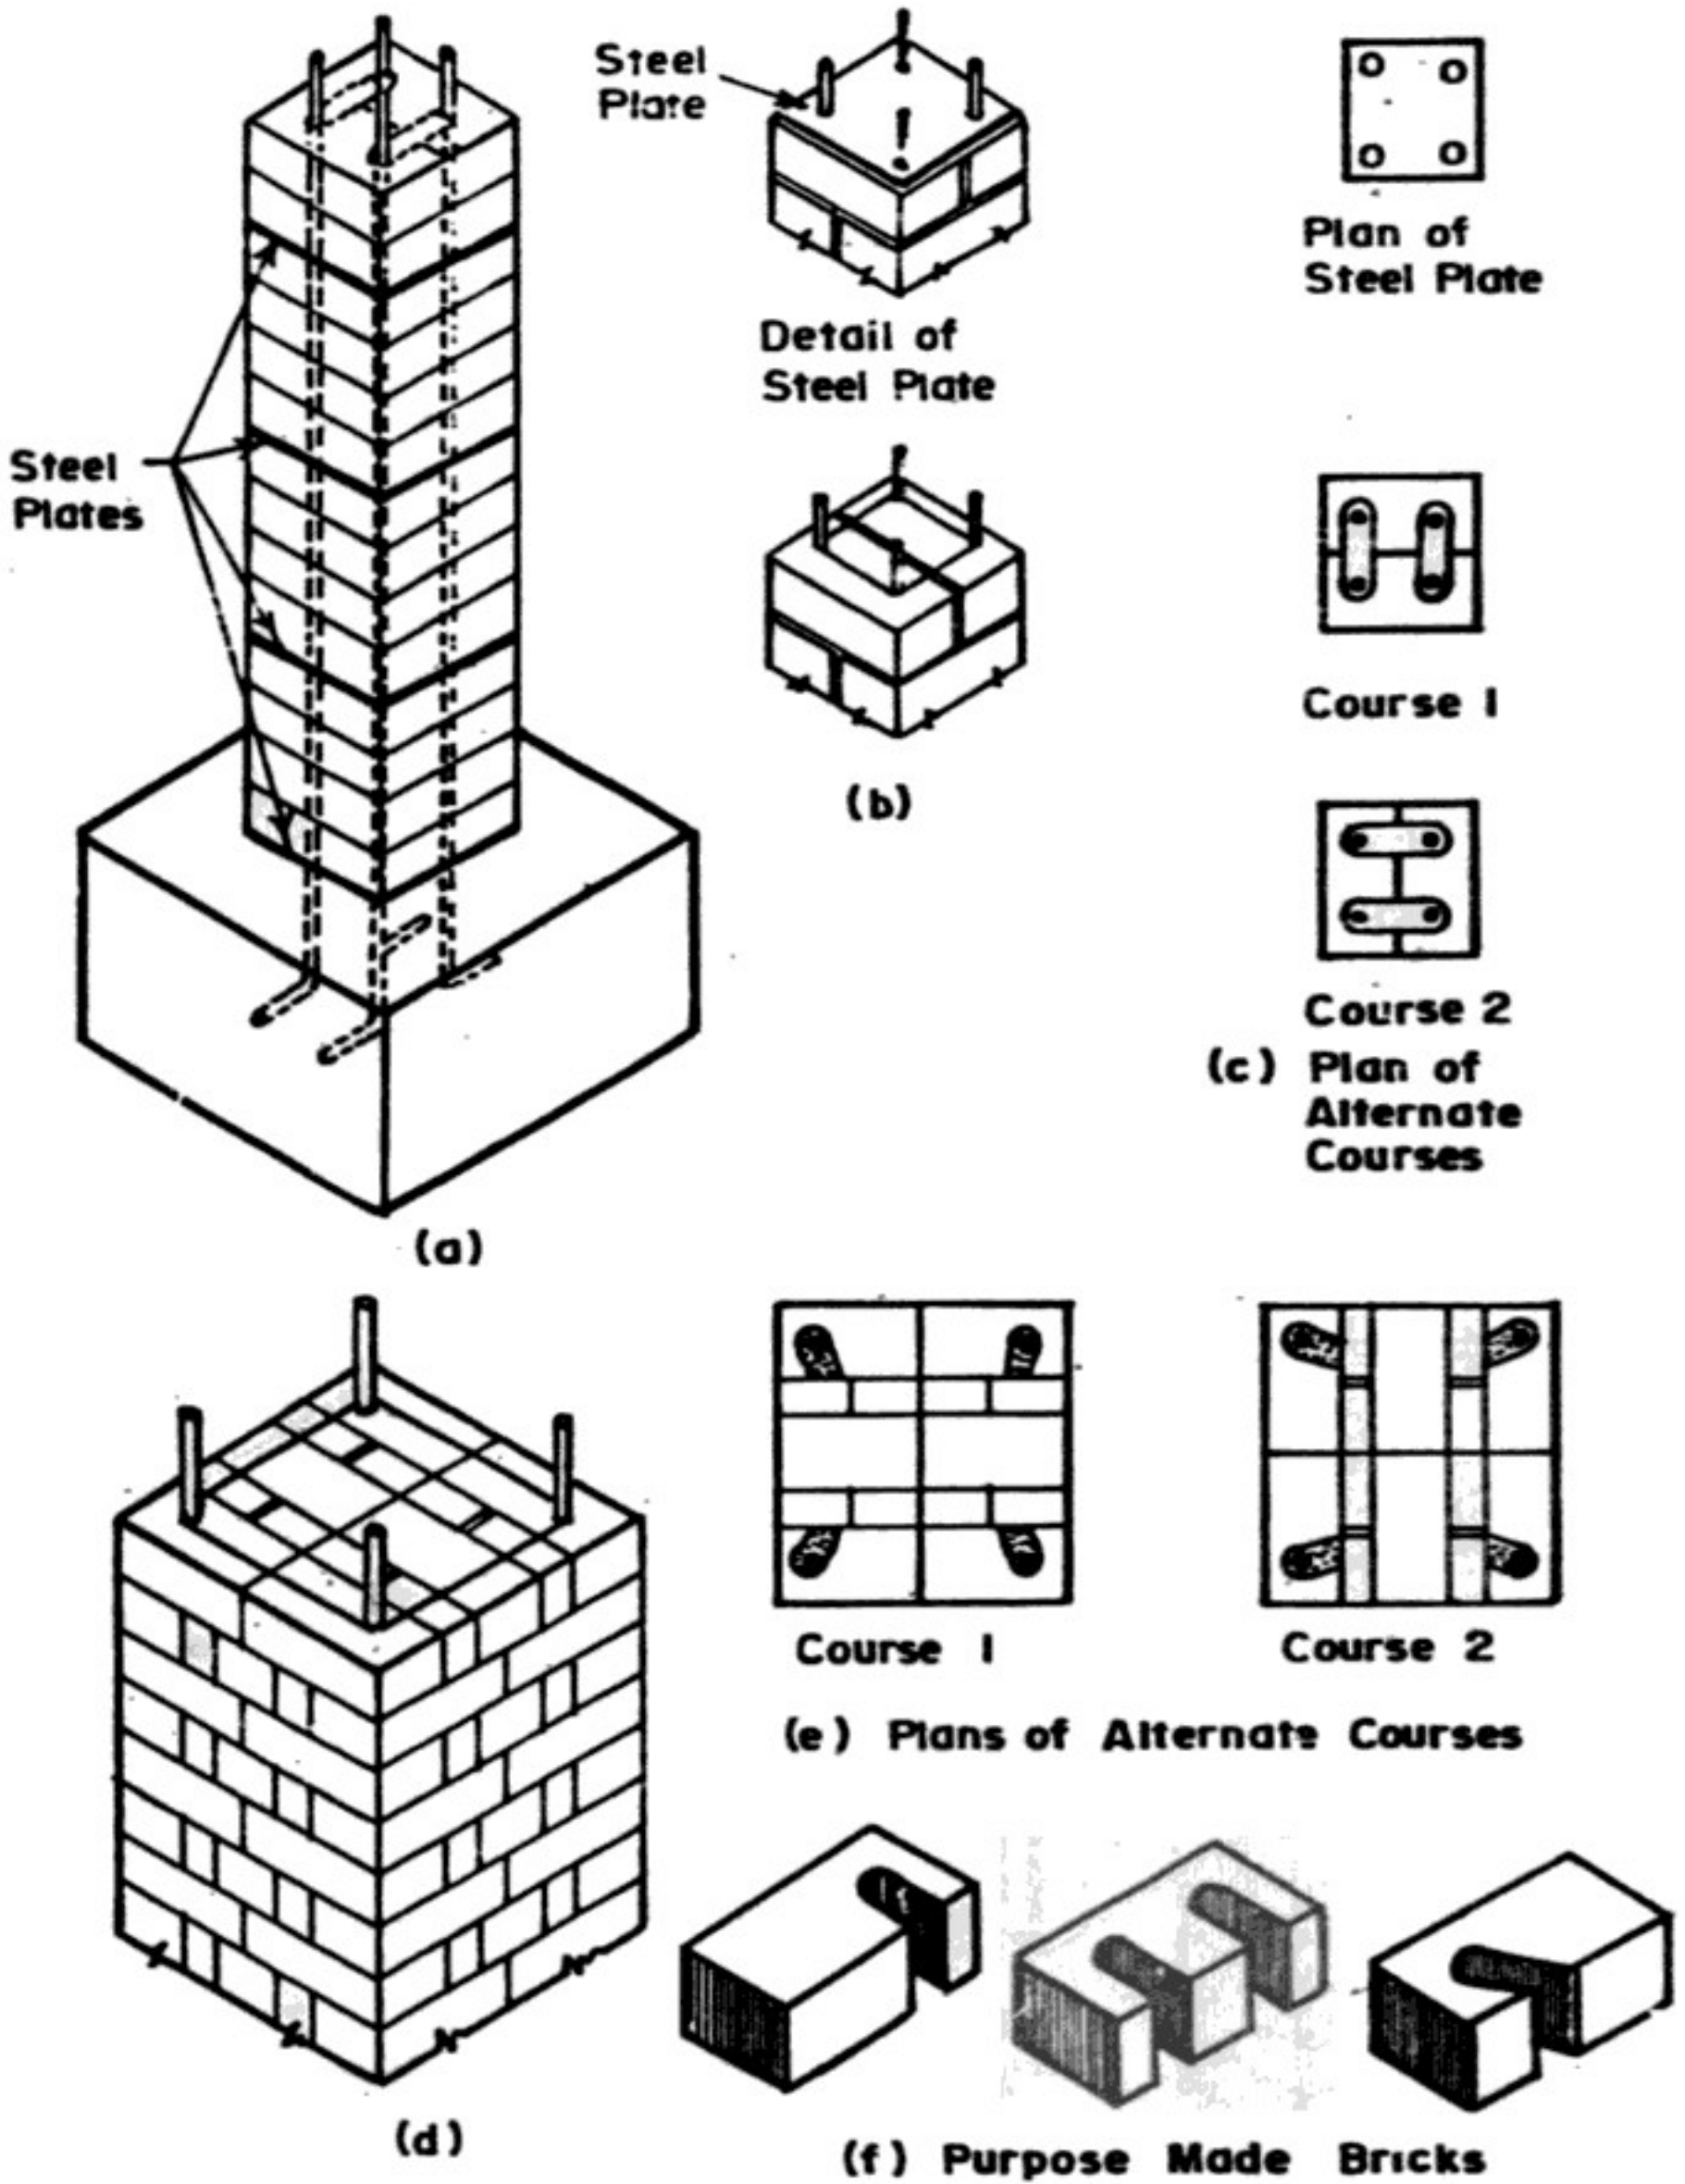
REINFORCED BRICK WORK PIERS.
